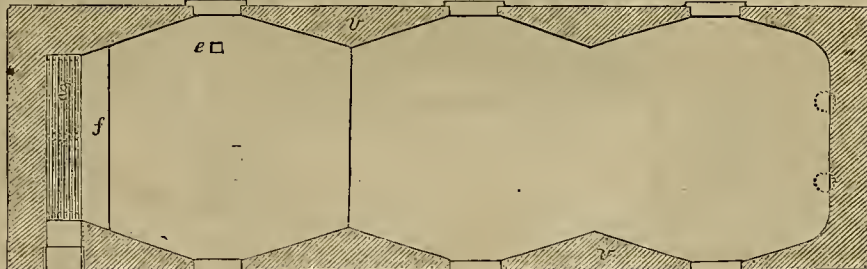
LONG ROASTING FURNACE, GROUND PLAN.
